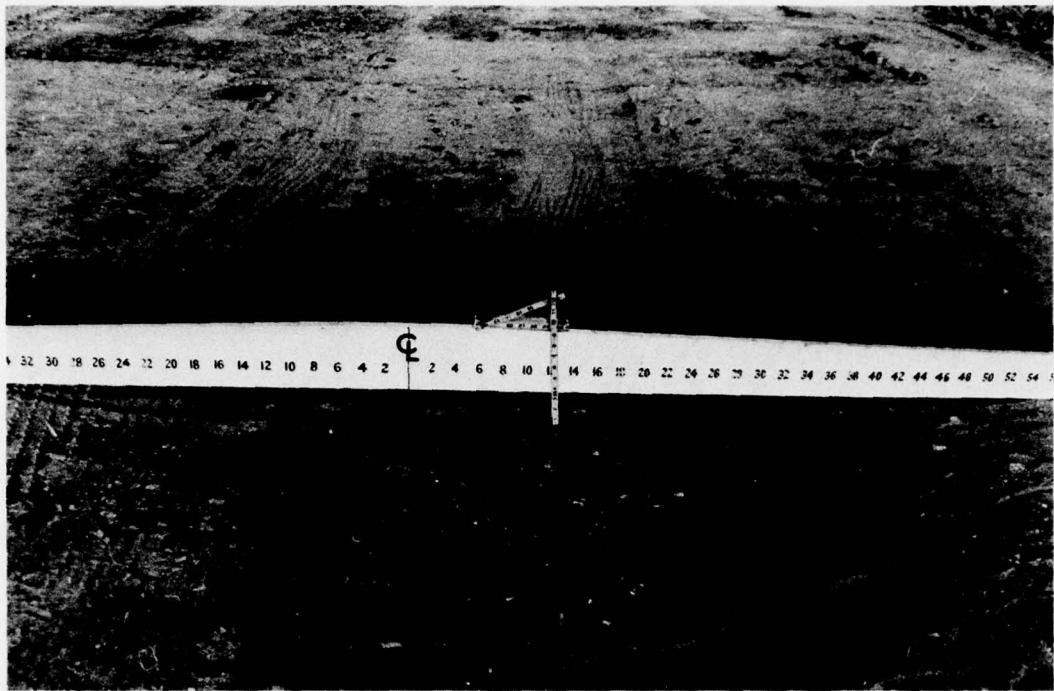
General view of Test Section No. 2, item 2, at end of traffic
